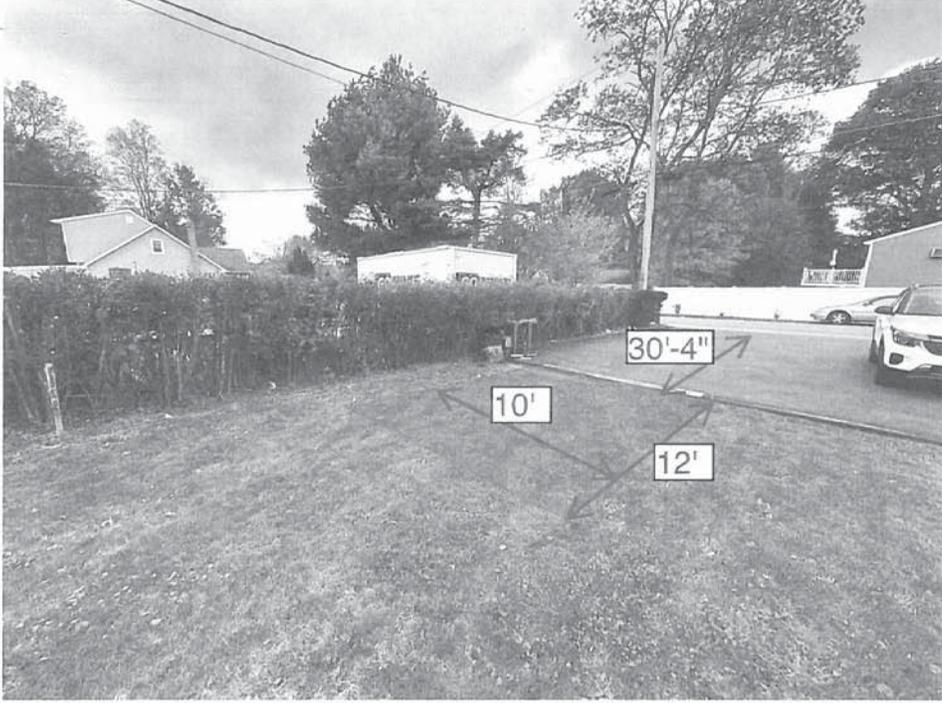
PROPOSED AREA FOR PREFAB SHED WITH DIMENSIONS
